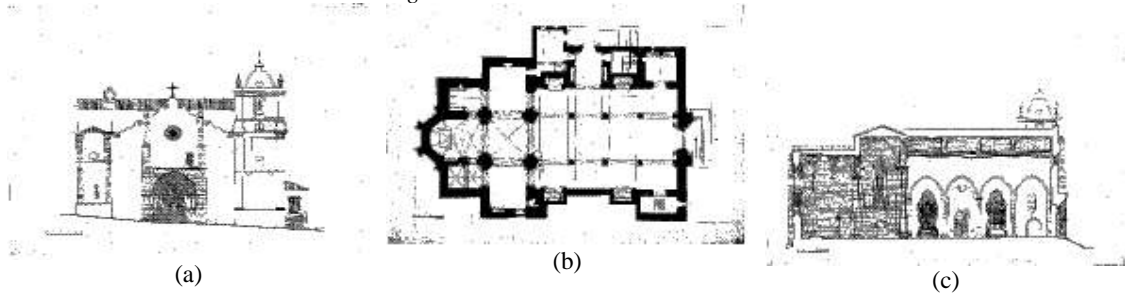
Geometry: (a) main façade; (b) plan; (c) longitudinal cross-section
